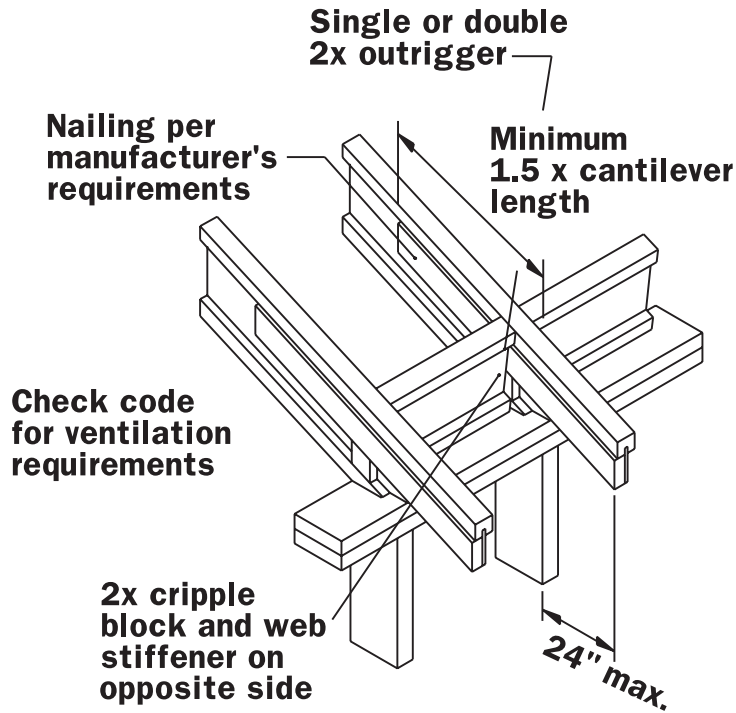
Gable End Rake Overhang Outlookers Attached to I-Joist Roof Rafter
